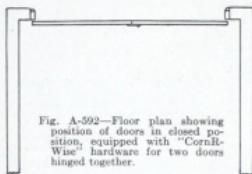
Floor plan showing position of doors in closed position, equipped with "CornR-Wise" hardware for two doors hinged together.
